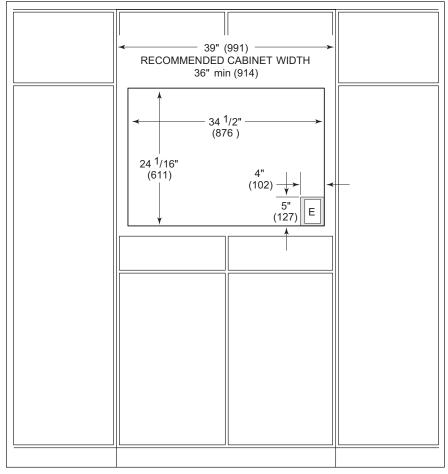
Front Cutout Dimensions and Electrical Placement #802984 Rev. C June 2005 2-6
